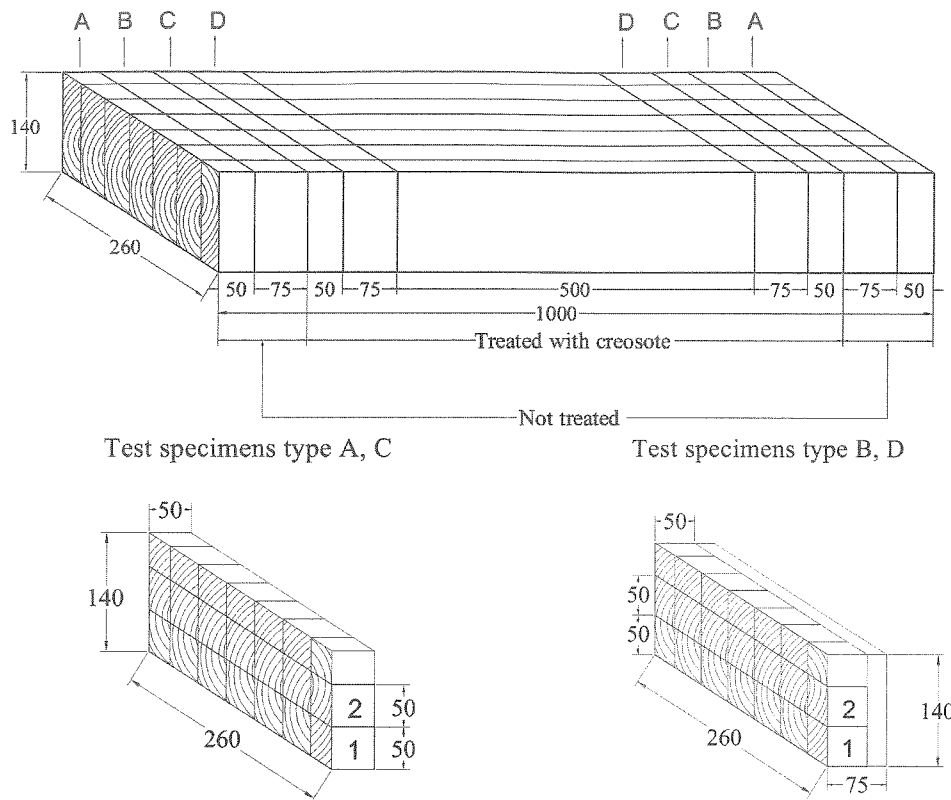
Test piece cutting plan for ER10 GLT; A and C: specimens for shear tests; B and D: specimens for delamination and subsequent shear tests; numbers 1 and 2 indicate the test pieces extracted for shear tests, from both specimens A and B
